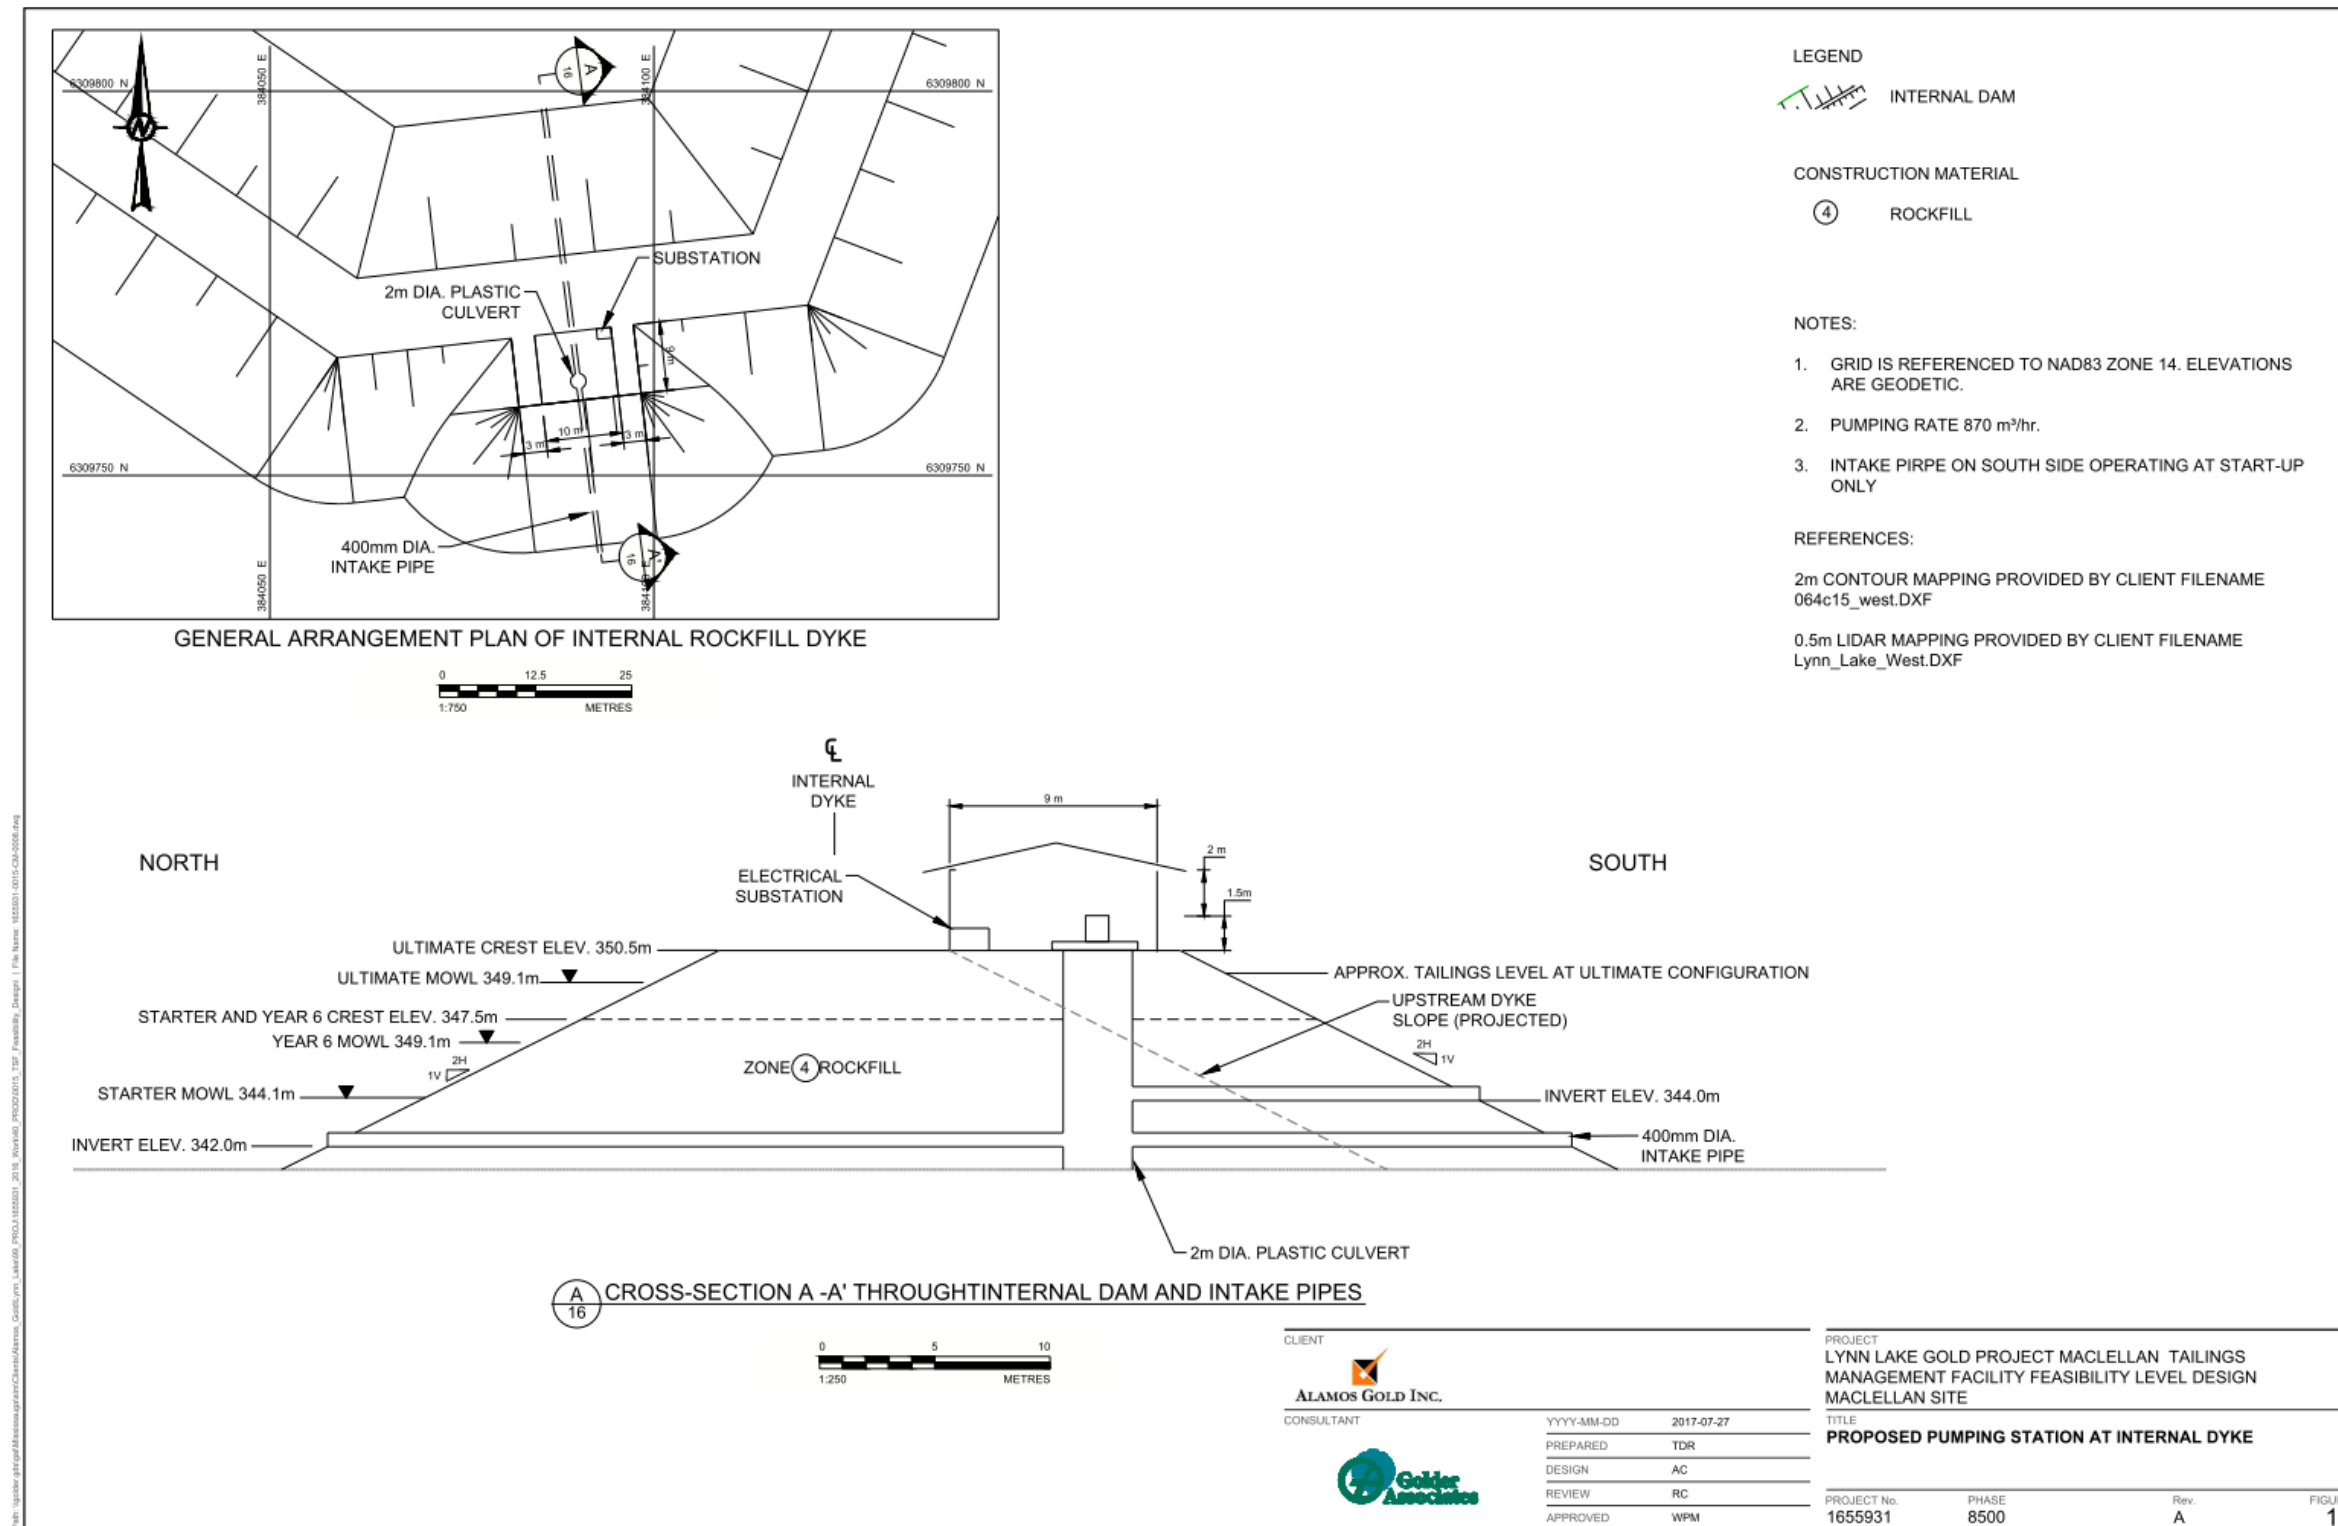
Proposed Tailings Pond Pumping Station Layout
